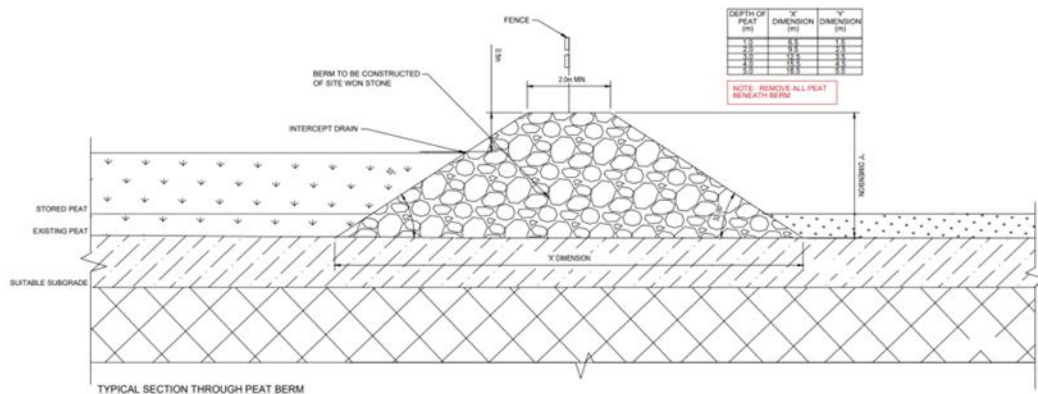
Cross-Section of a Peat Cell retaining Berm
